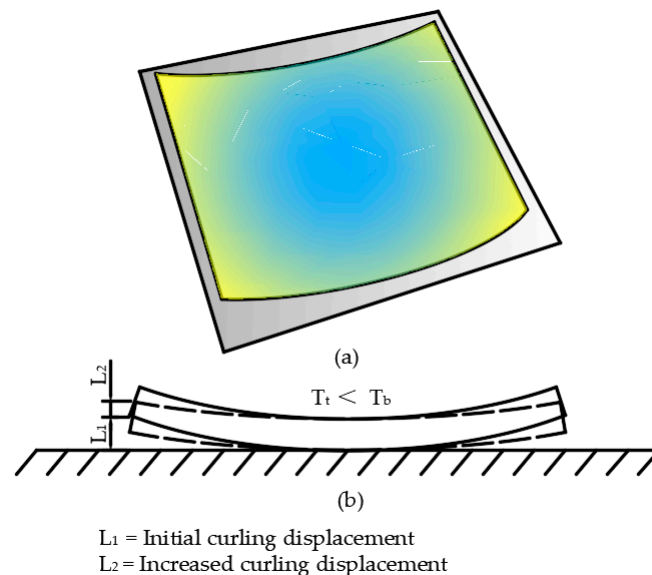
Increased curling deformation of concrete pavement. (a) Spatial diagram and (b) planform.
